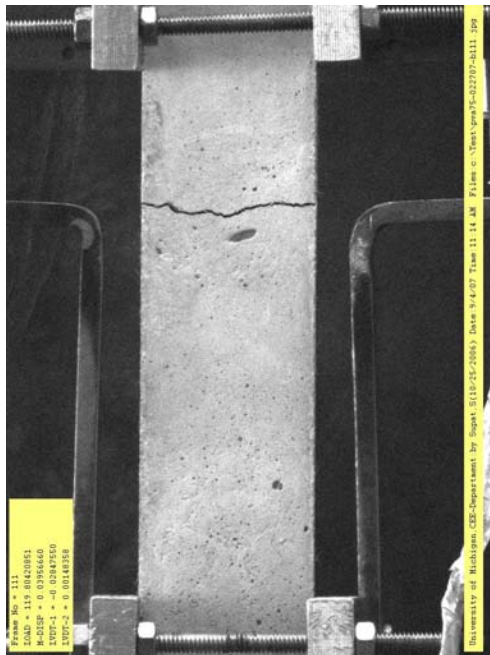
Typical failure crack in a tensile specimen reinforced with PVA fiber
